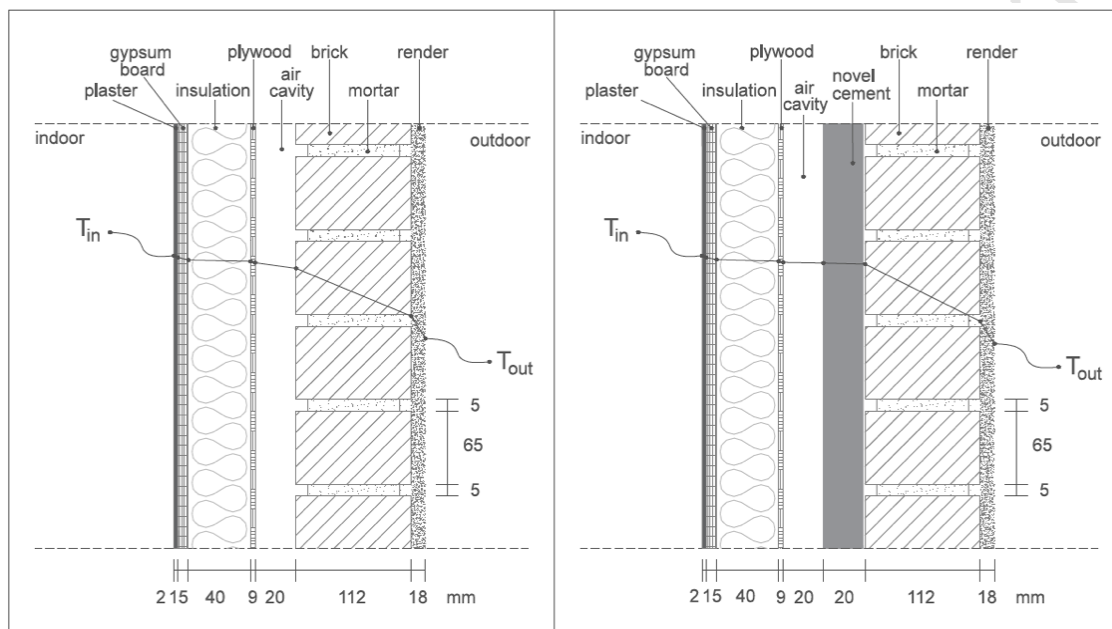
Typical external composite brick wall of domestic building in United Kingdom. (Left: Wall section and temperature ( $T$ )profile. Right: Wall-section including a layer of MKNS and temperature profile)
